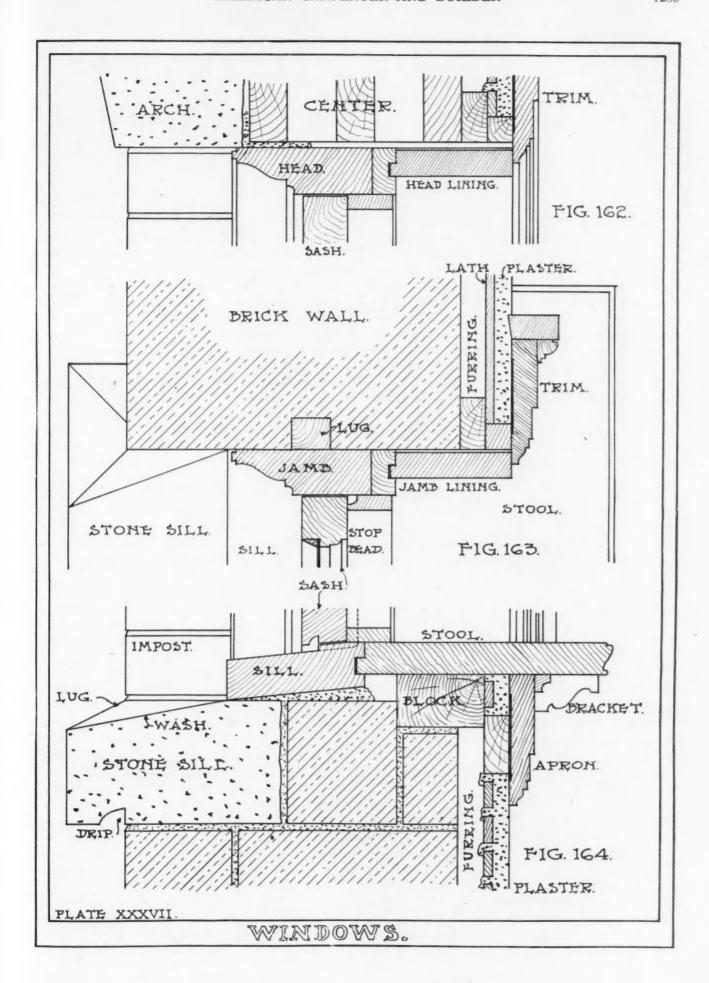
is a vertical section showing the construction at the head of the frame. The trim is mitered, put together with slip tongues and glued. The head lining is tongued into a piece of finishing wood on the inside of the frame head.
